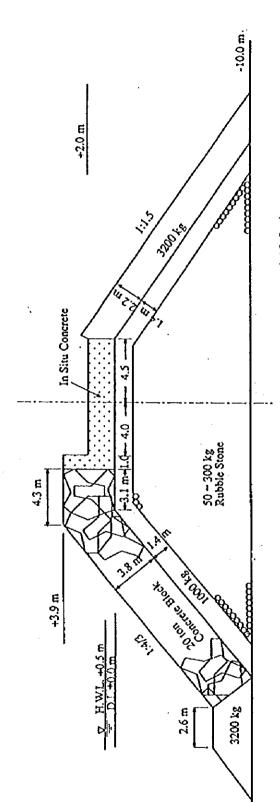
Standard Cross Section of Breakwater (-10.0m)
